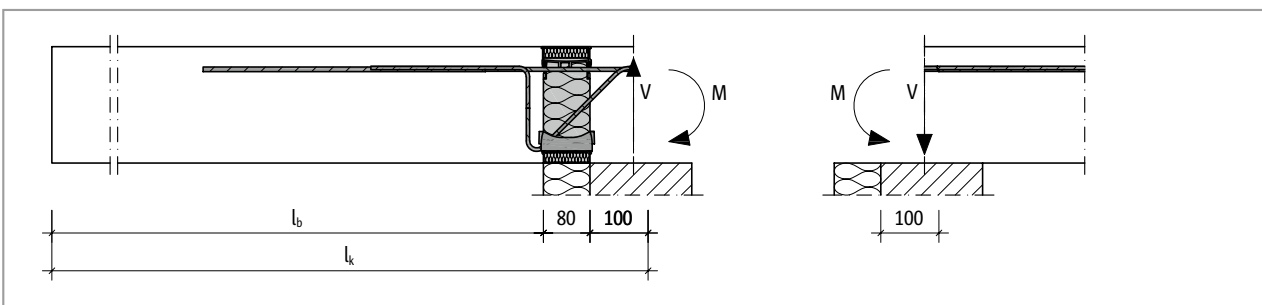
Schöck Isokorb® Type K Determined design section dimensions applied to floor slab
